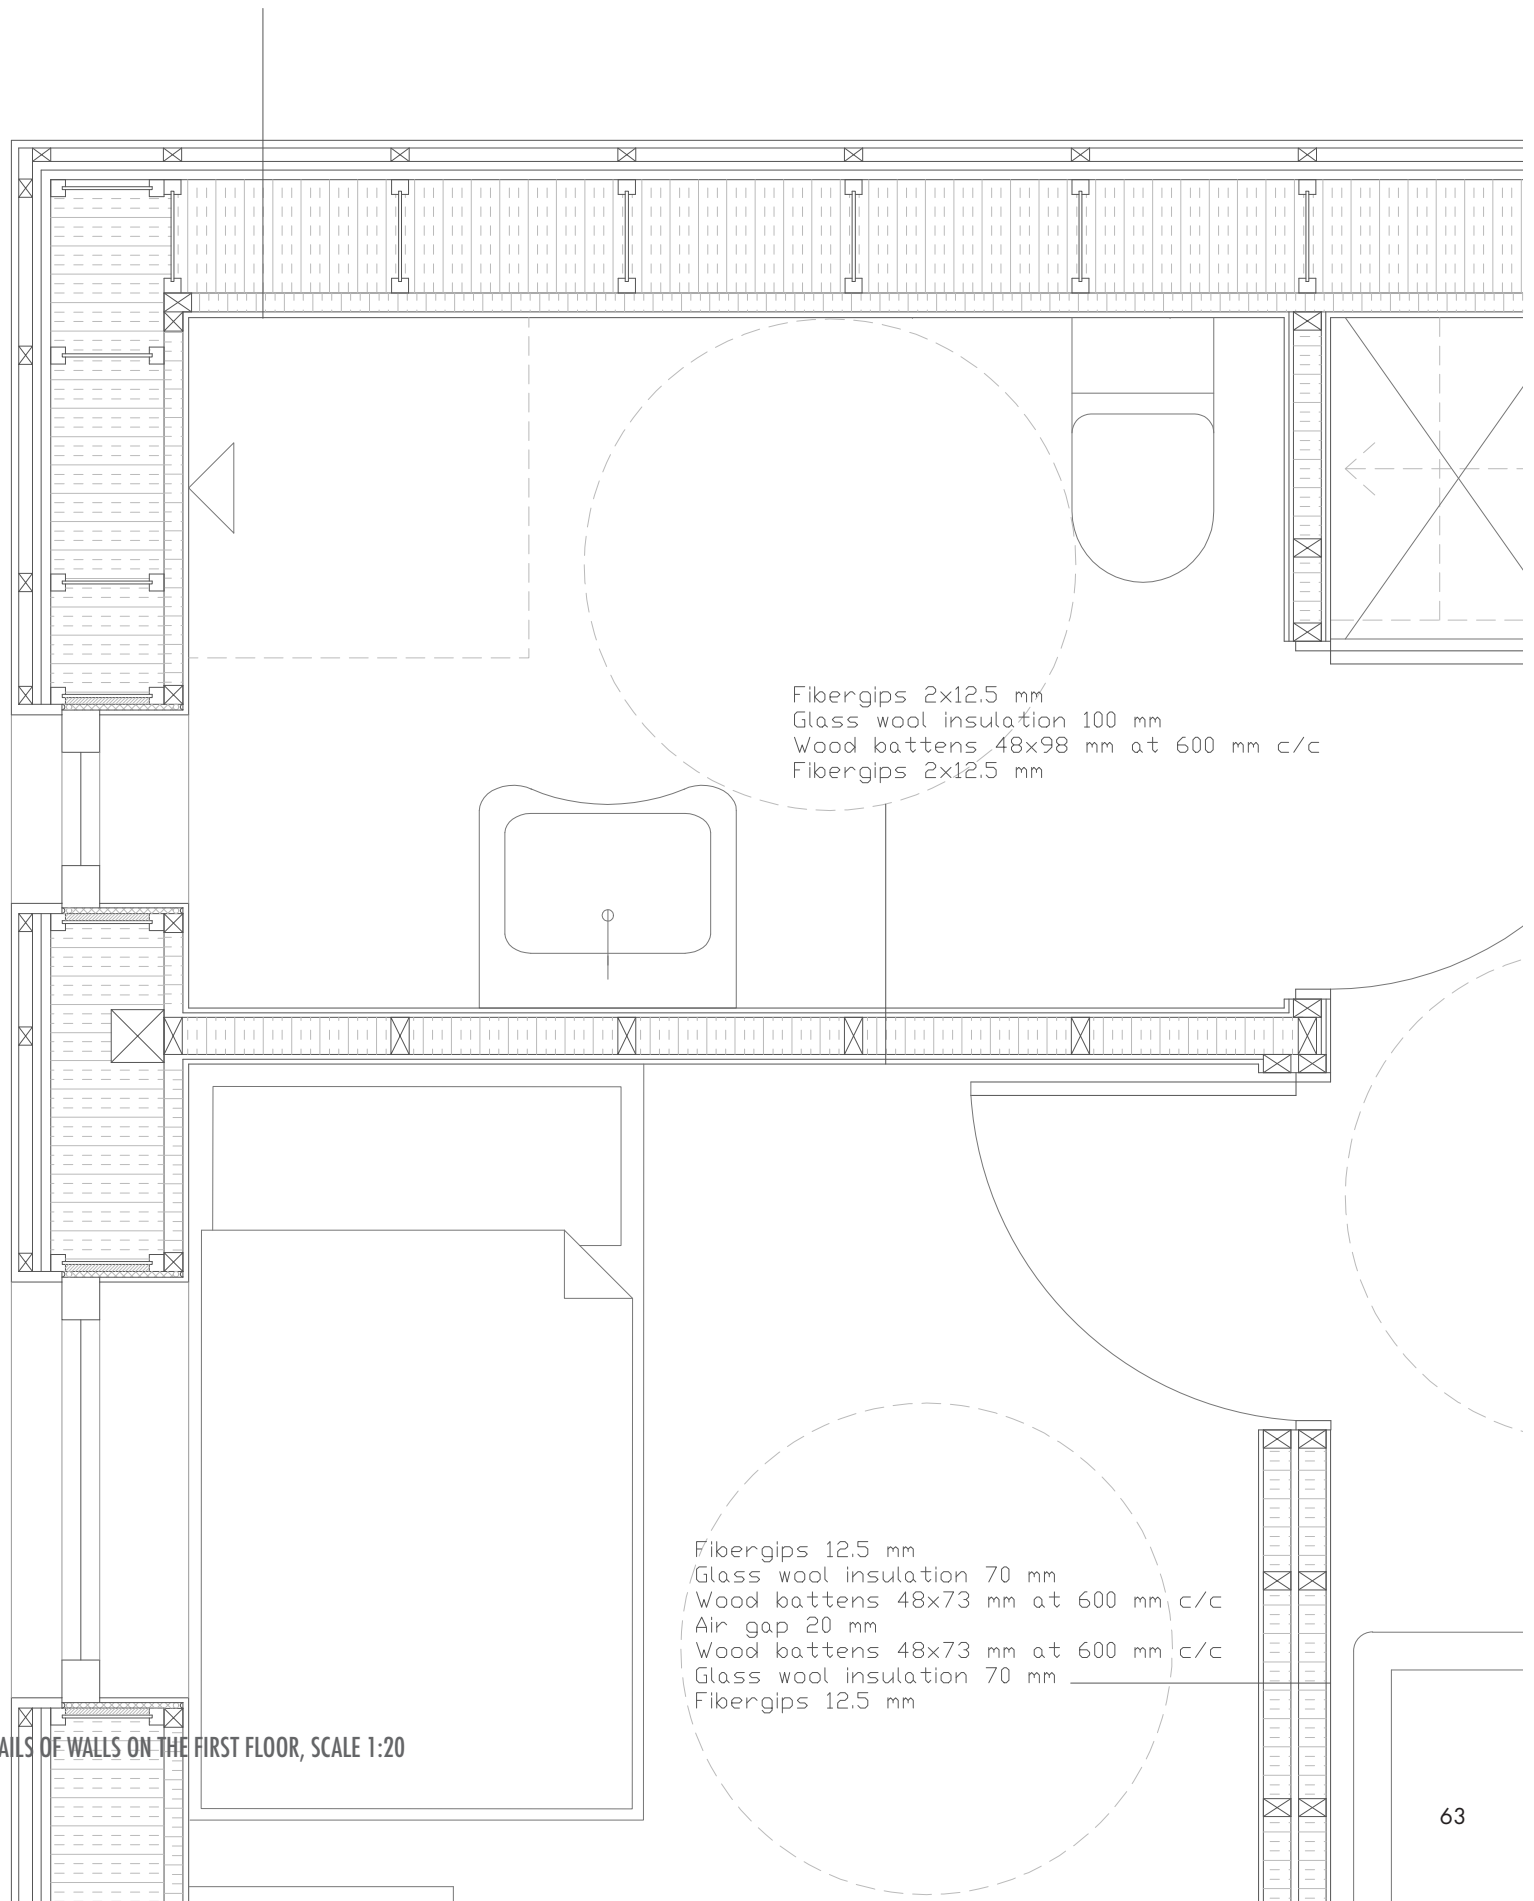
DETAILS OF WALLS ON THE FIRST FLOOR, SCALE 1:20
